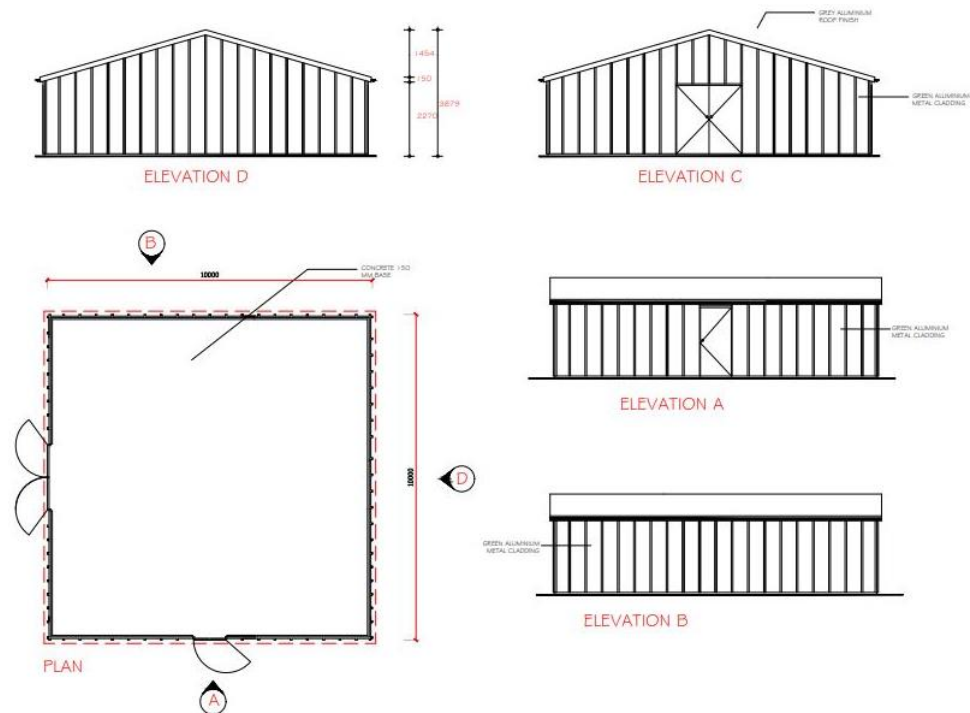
Proposed storeroom floor plan and elevations – previously refused application (21/05790/FULL1).
